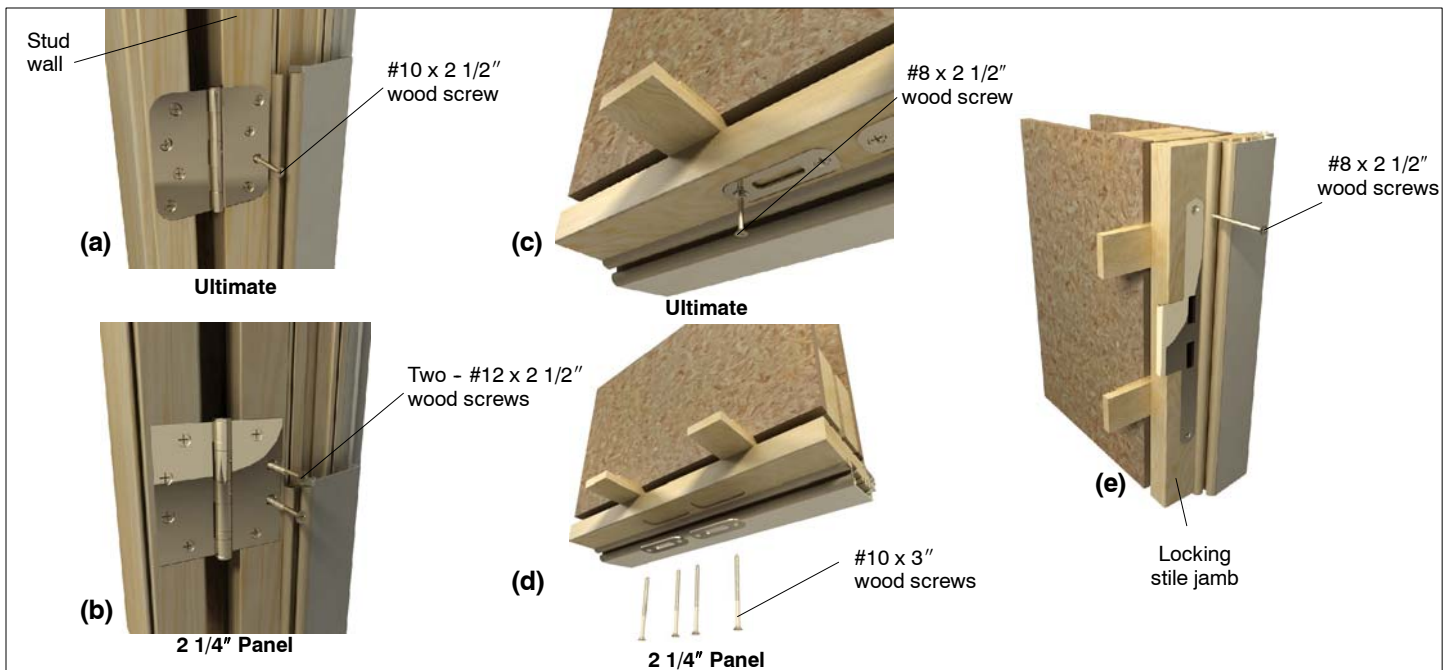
Securing the door. (Inswing doors shown but applies to Outswing doors as well.)
